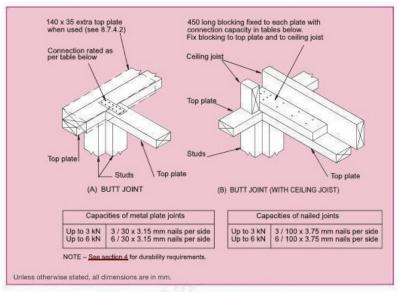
Connecting top plates to external walls at right angles - Walls containing bracing (see 8.7.3.4)
